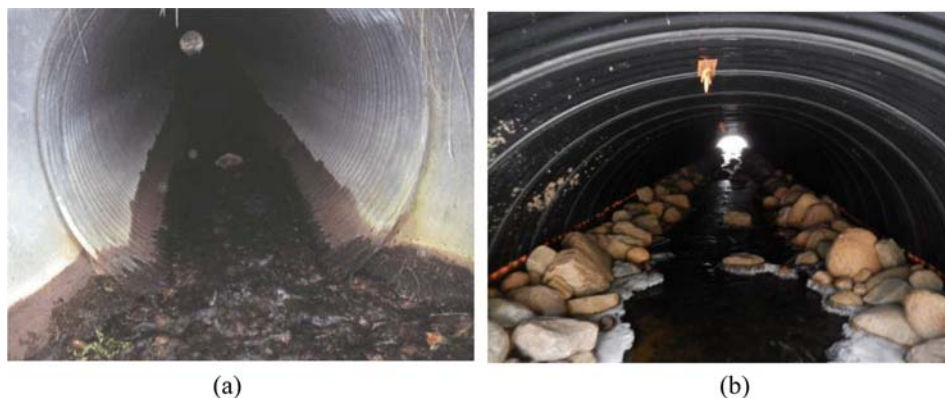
(a) Pre-existing 4.5-ft CMP culvert, (b) culvert designed according to USFS (2008) and installed in 2008 (image taken 1/6/2016, over Duck Creek in northern Wisconsin).
